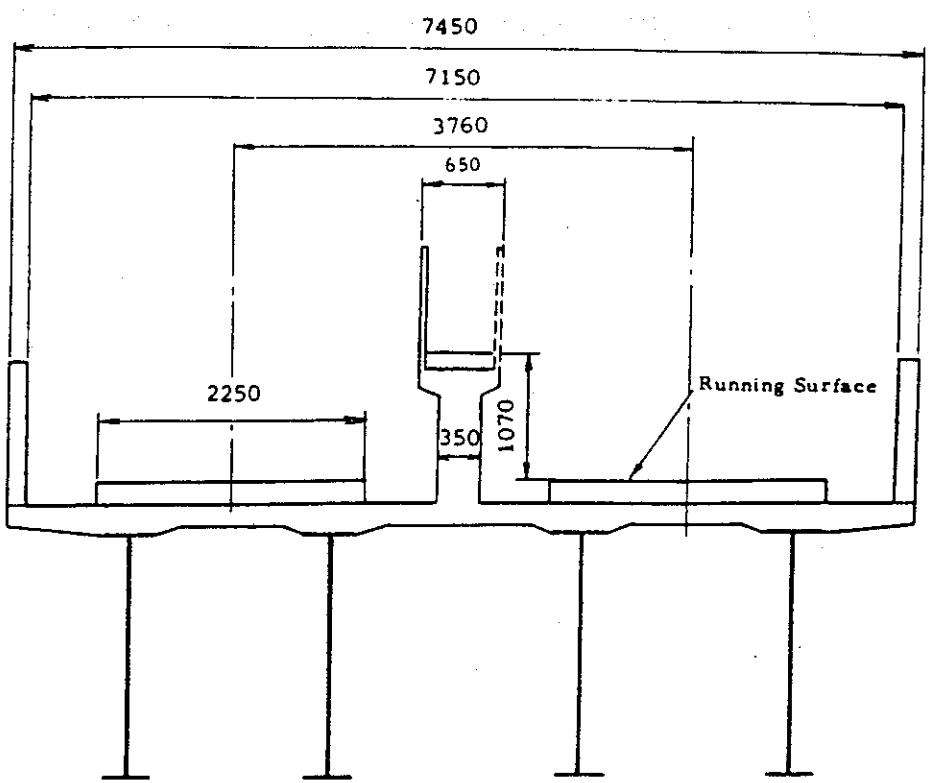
CROSS SECTION OF TYPICAL GUIDEWAY
